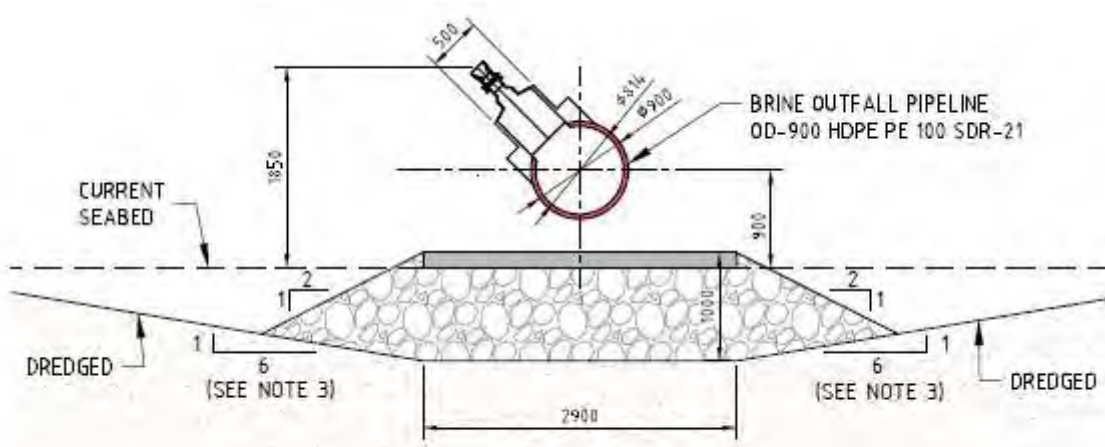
Elevation view of the EPDP proposed diffuser design.
